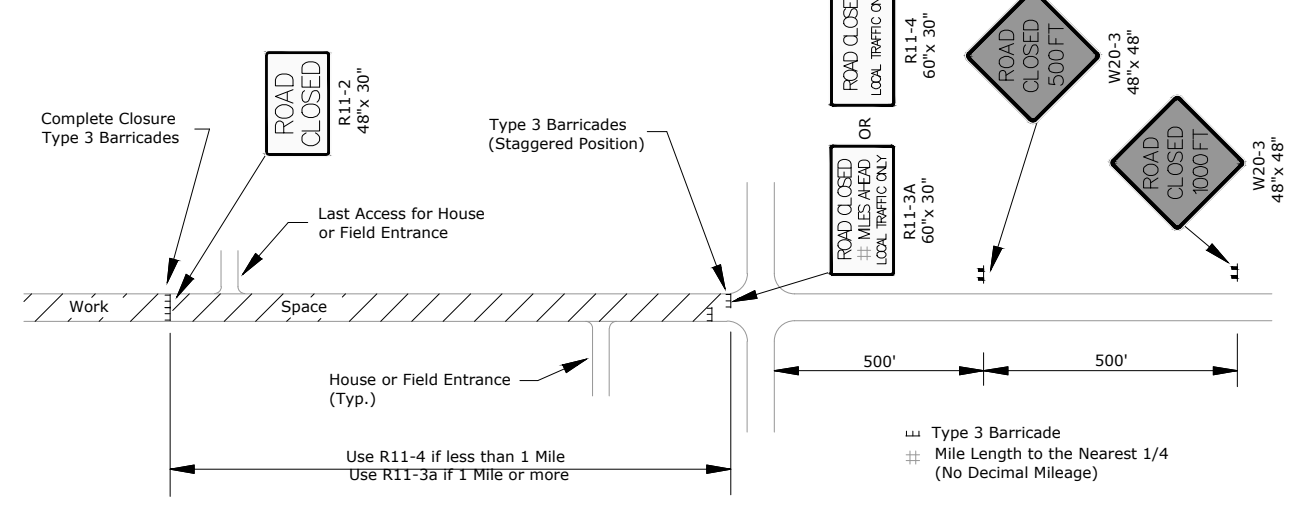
TYPICAL SIGNING FOR ROAD CLOSURE - LOCAL TRAFFIC ACCESS
